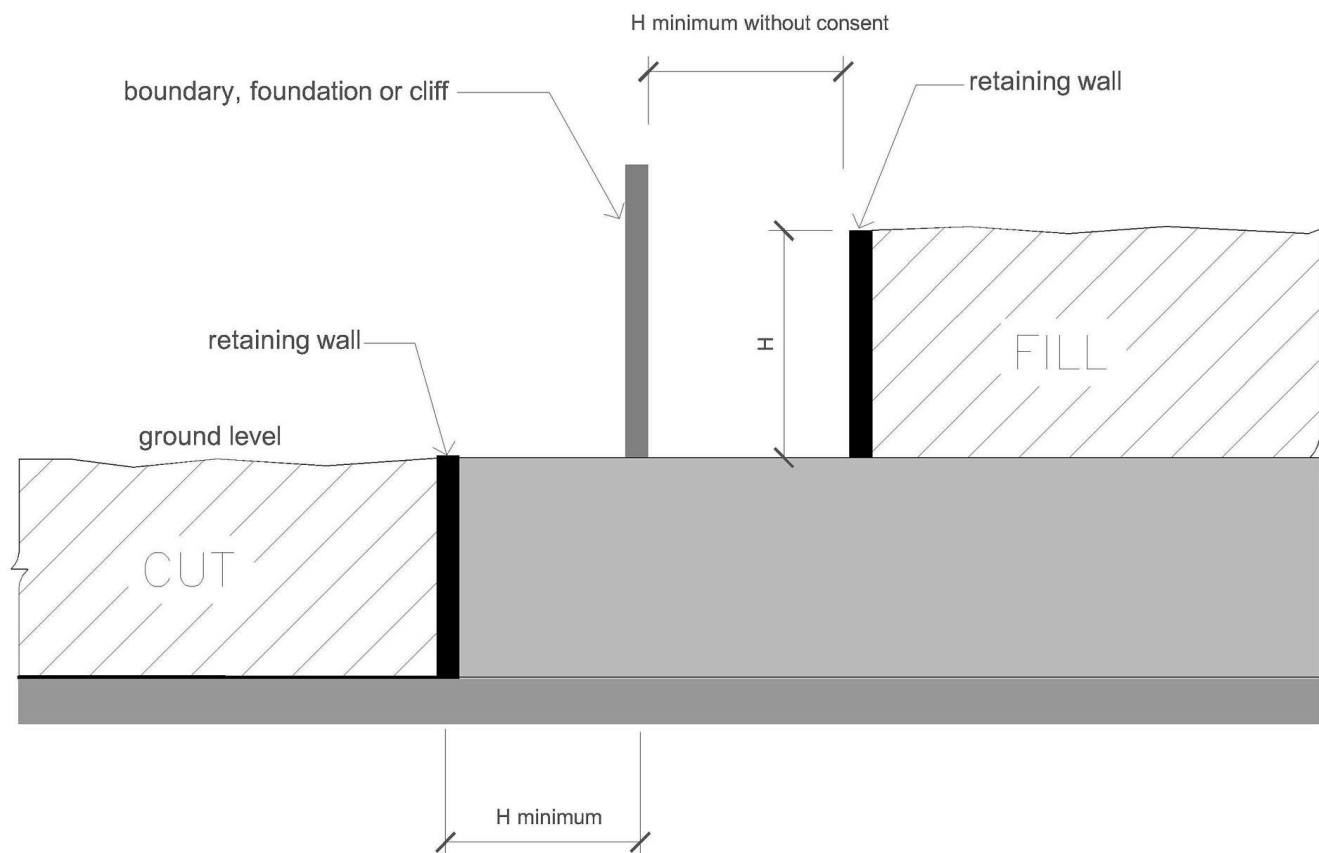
B: Cut and fill supported by retaining walls (elevation view)
